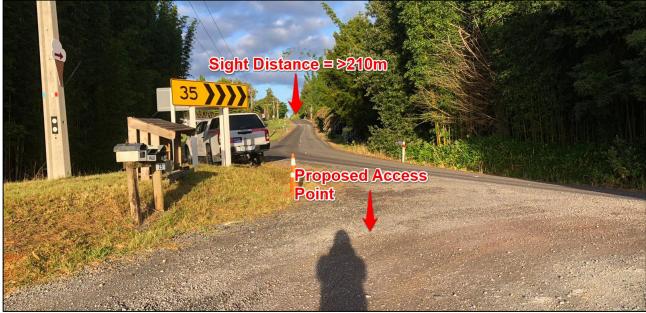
Proposed Vehicle Crossing Location on Koropewa Road Facing West, >210m Sight Distance Available.
